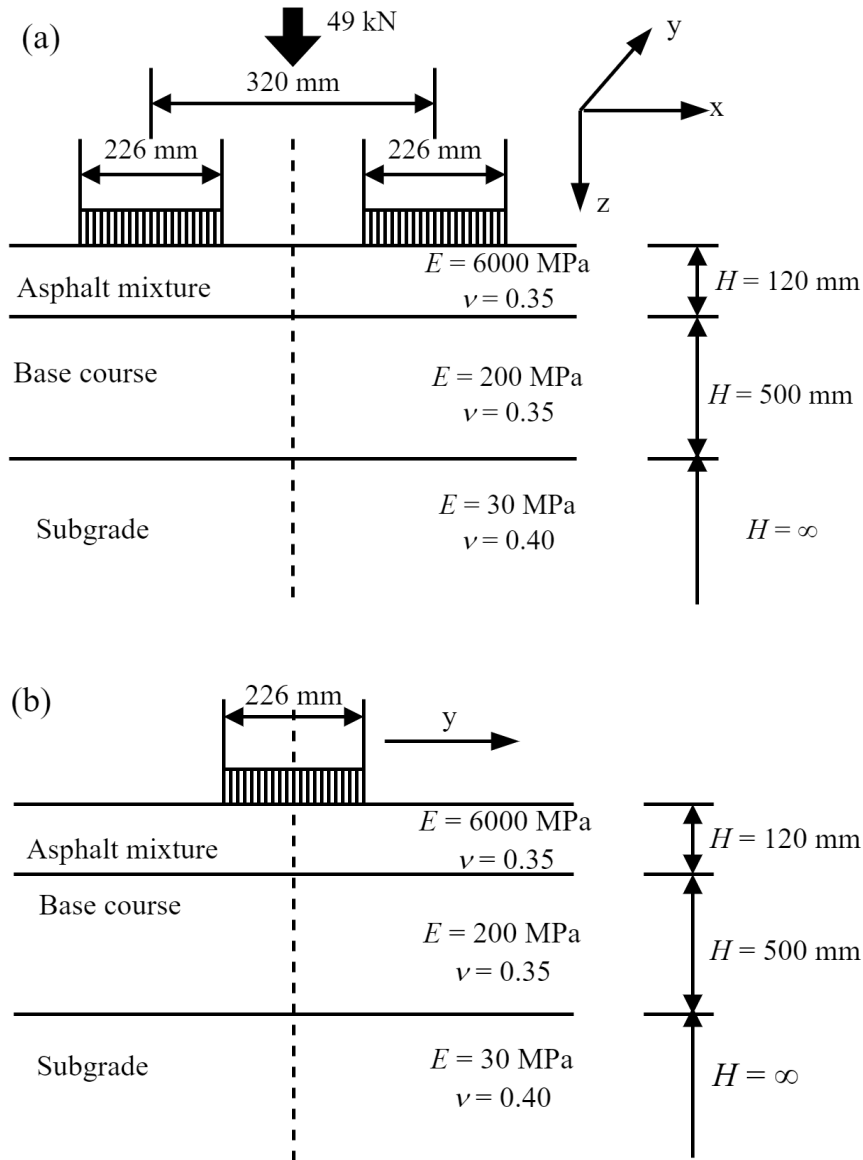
Pavement structure and traffic load conditions of multi-ring shear tests: (a) cross section; (b) longitudinal section
